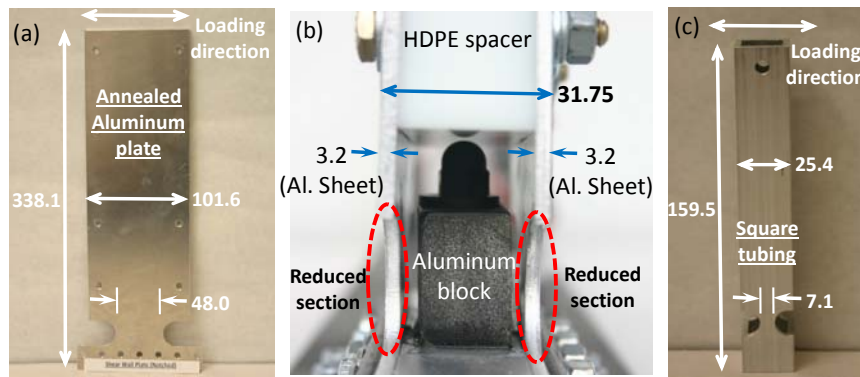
Constructed inelastic structural components: (a) shear wall elevation view; (b) shear wall fuse zoom-in side view; (c) column elevation view (dimensions in model scale, mm)
